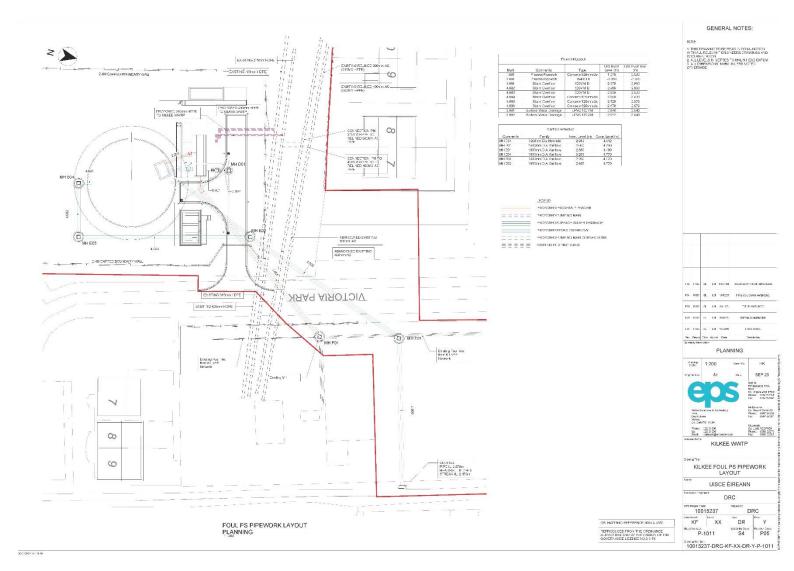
Foul Pumping Planning Application Pipework Layout (RFI)
